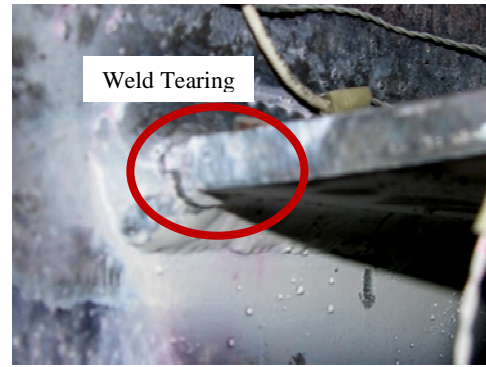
W1 in South Gusset-to-Beam Weld
